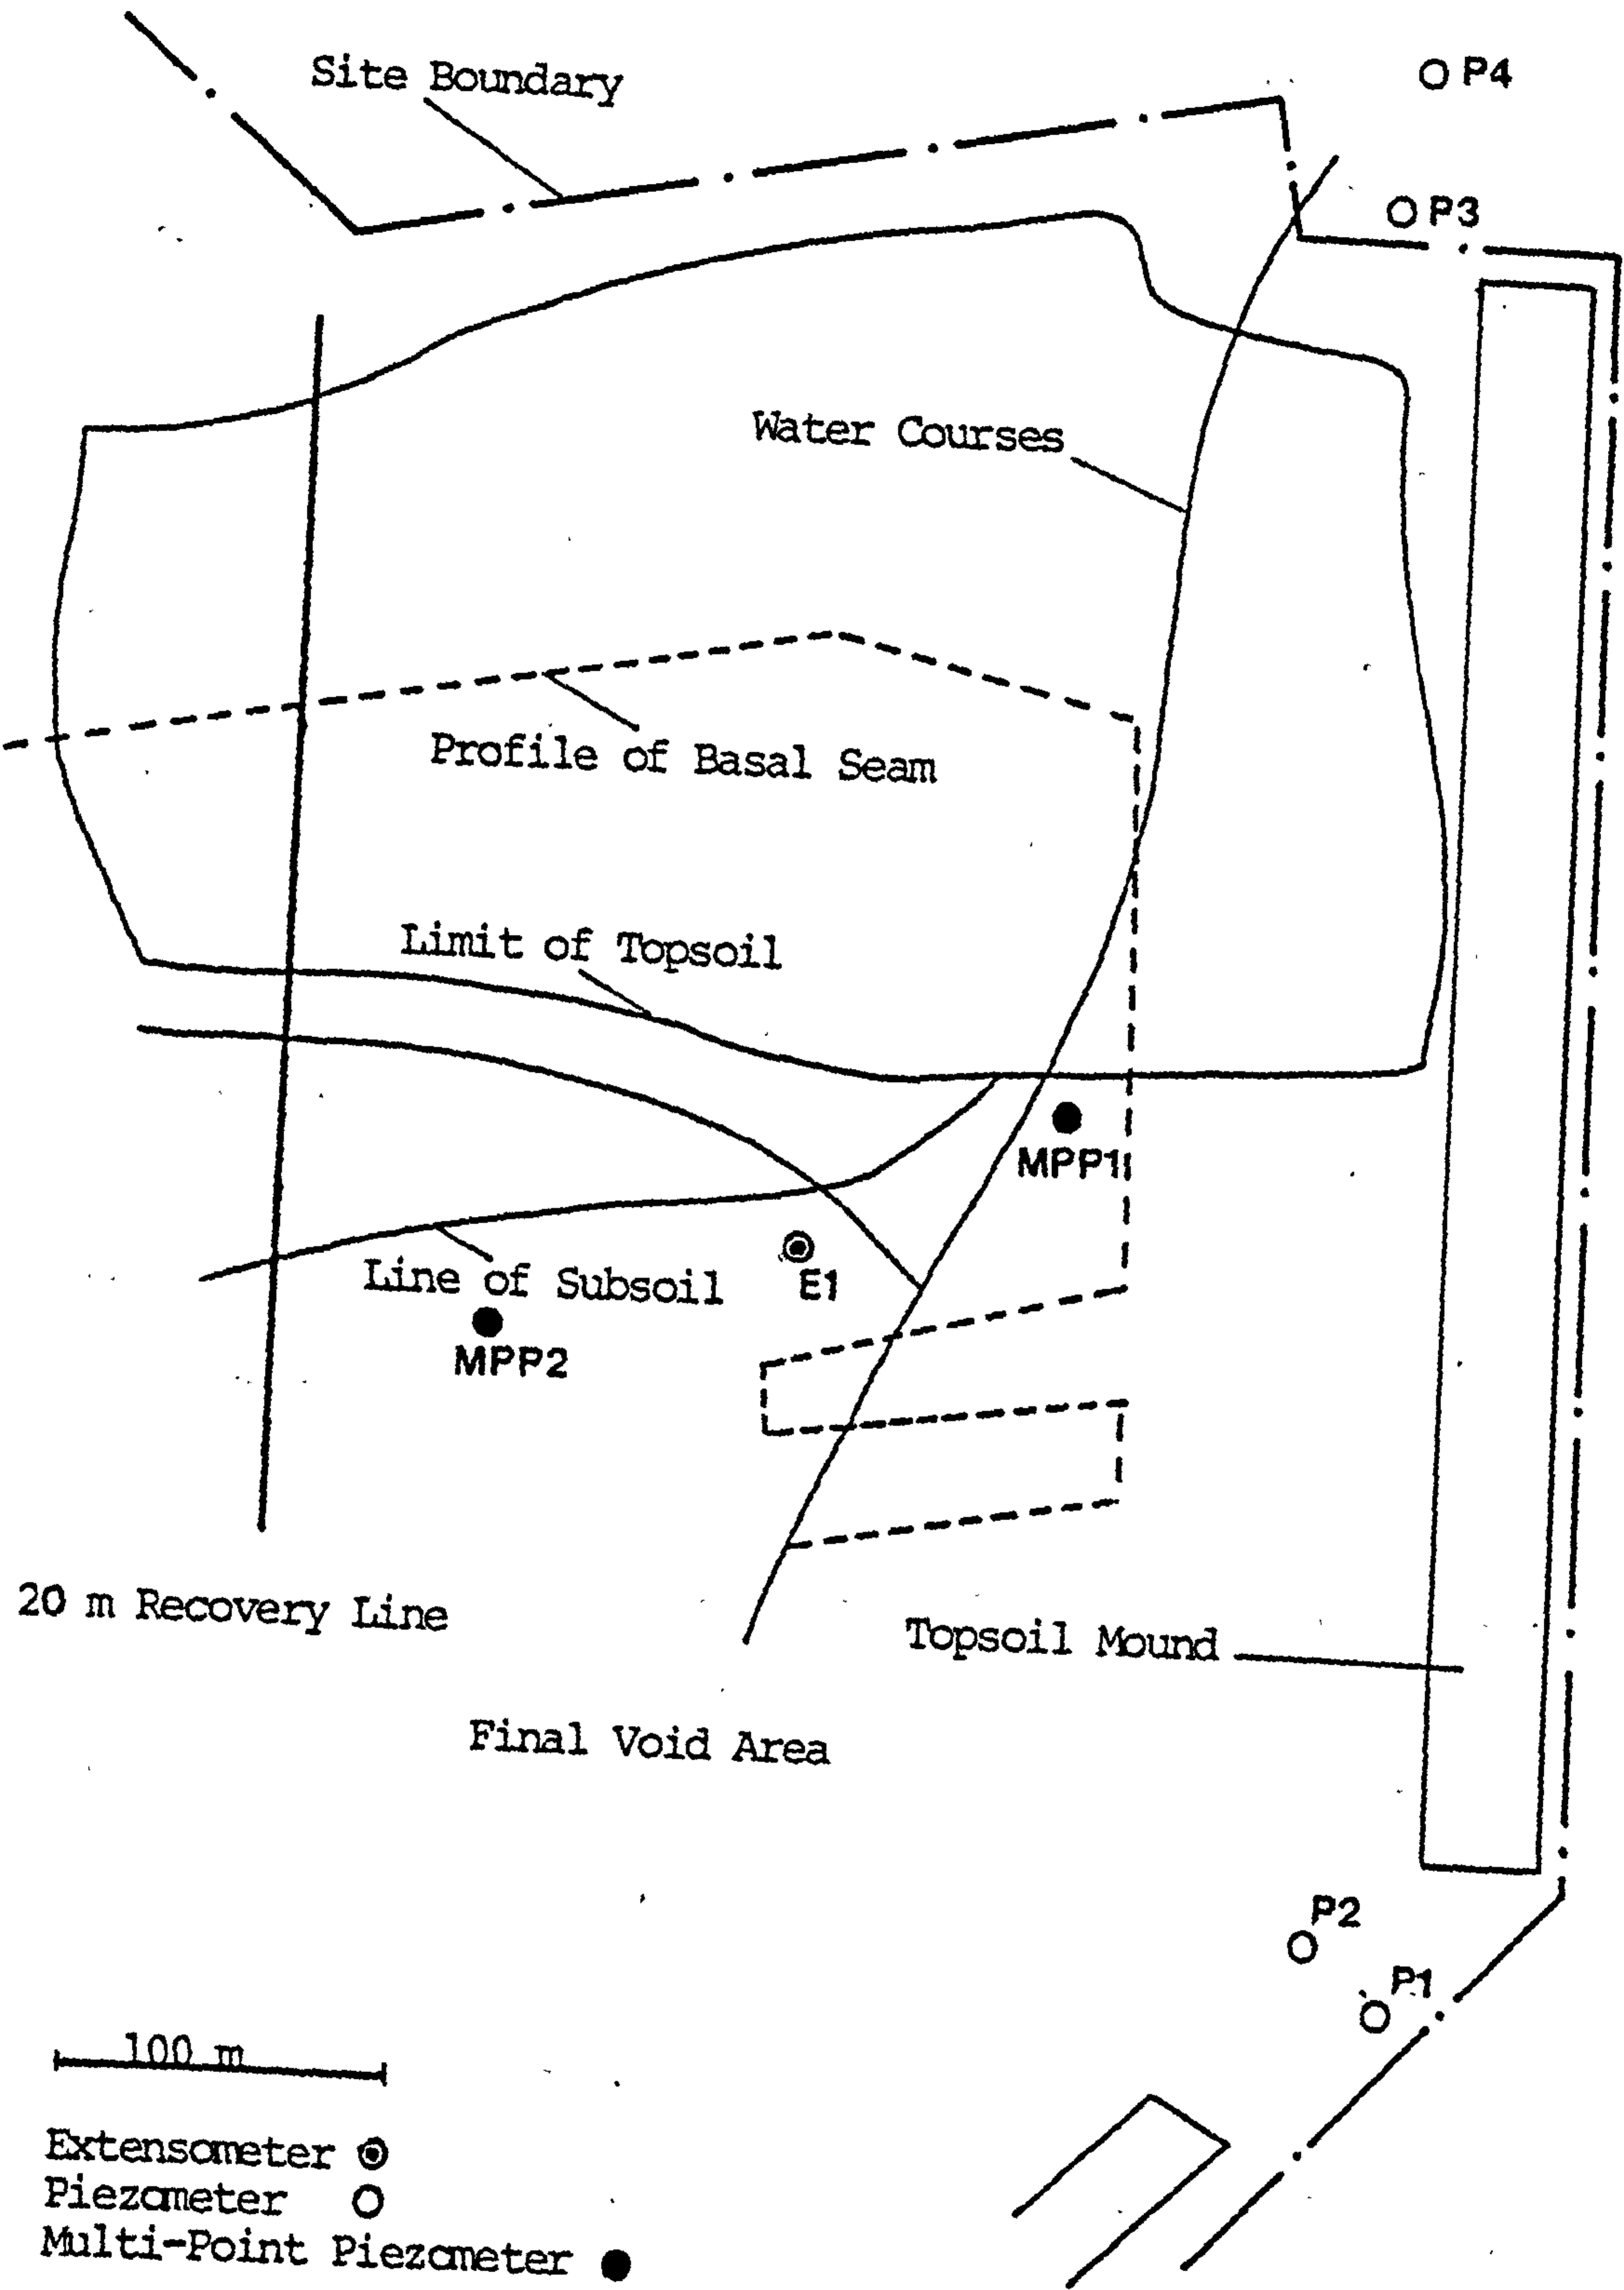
Revised Instrumentation Proposal (1) - Site B.
